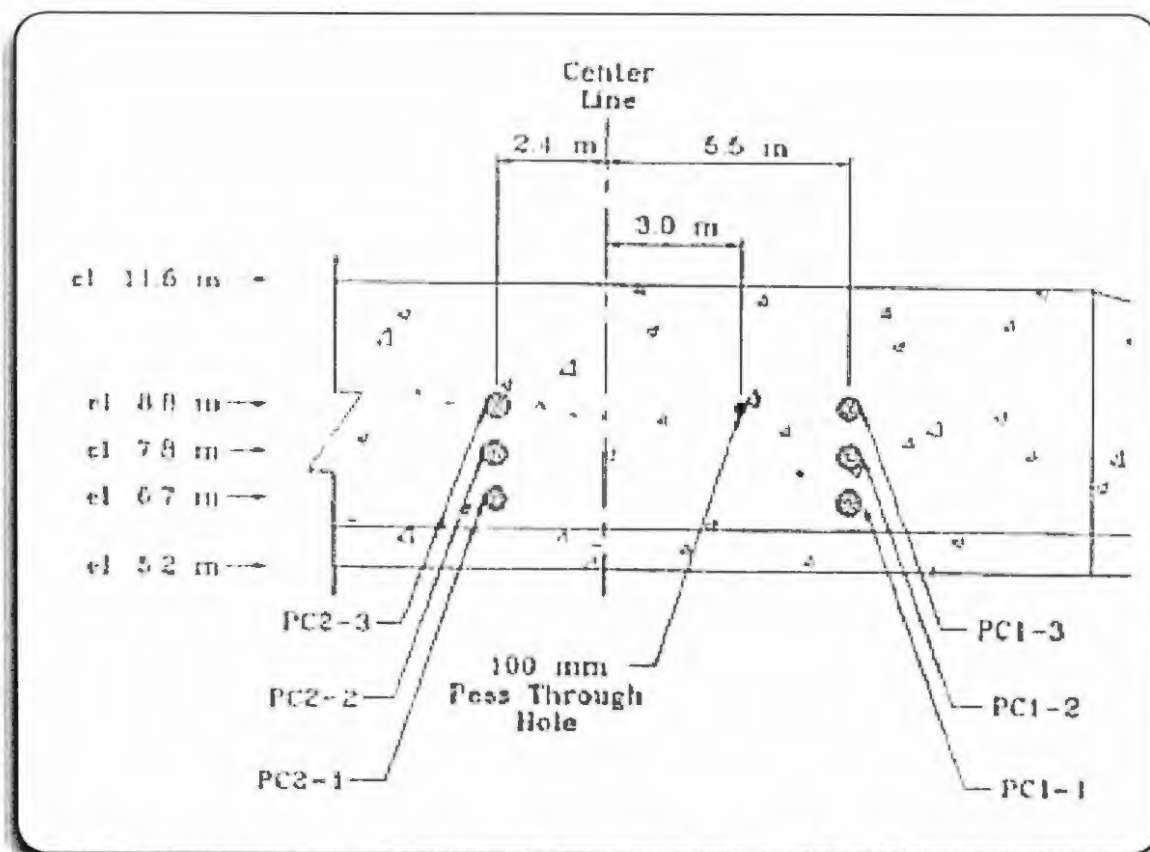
Location of pressure cells in North Abutment (Ref. 3)
